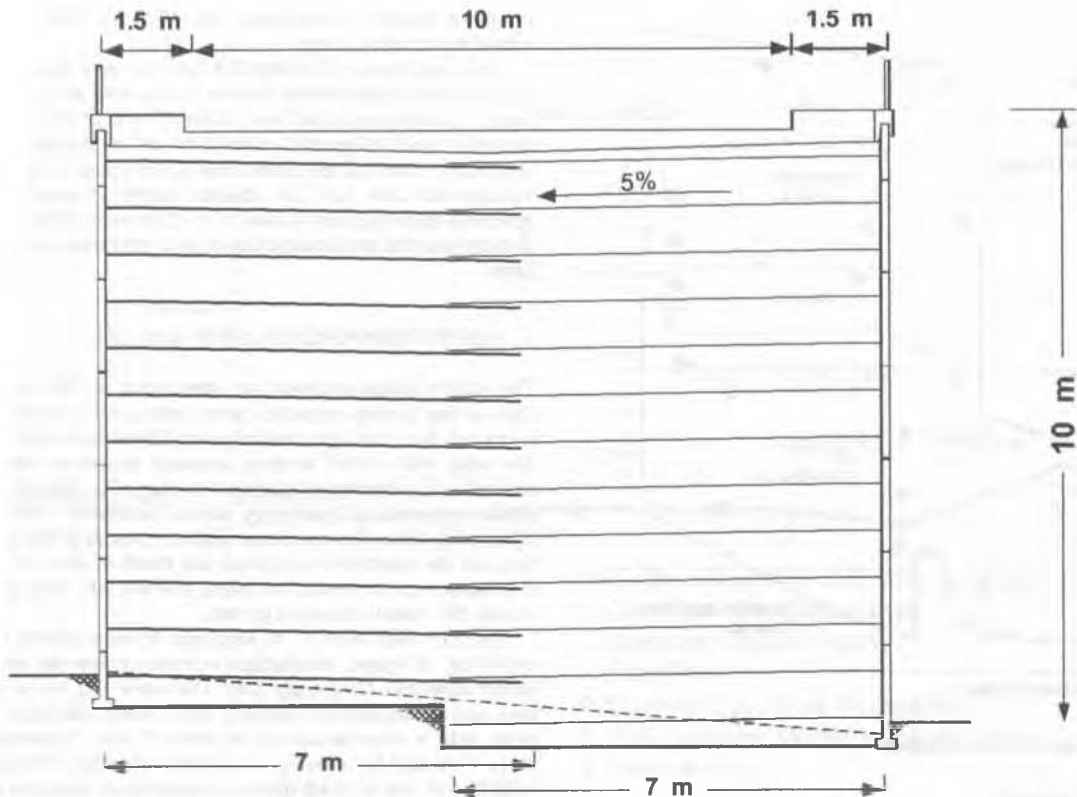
Cross section of the Arifiye Reinforced Earth Walls
